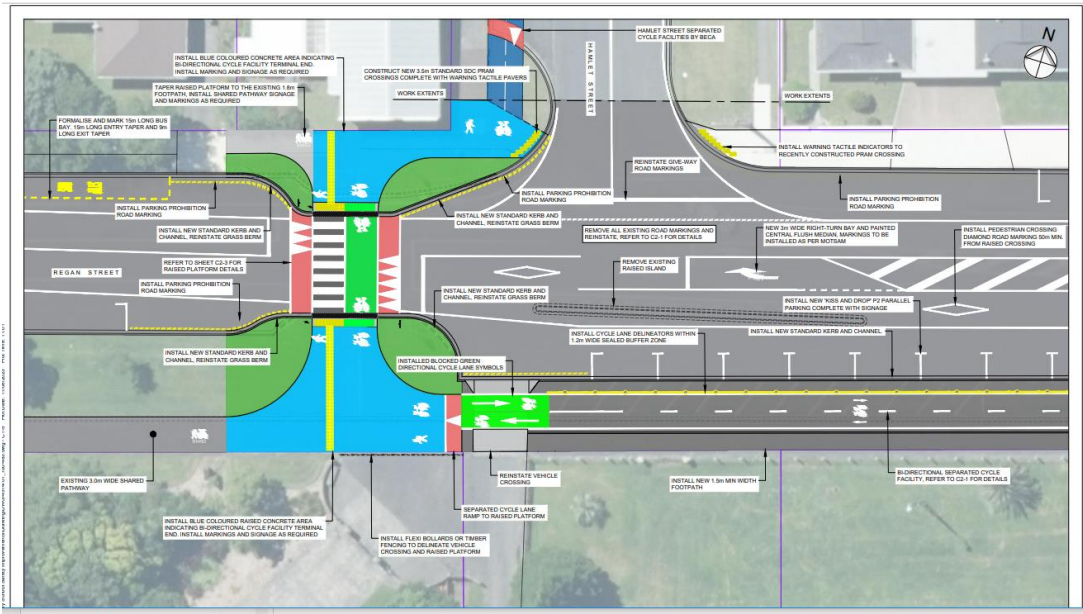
Pedestrian Crossing Upgrade on Regan St outside Stratford Primary School.
